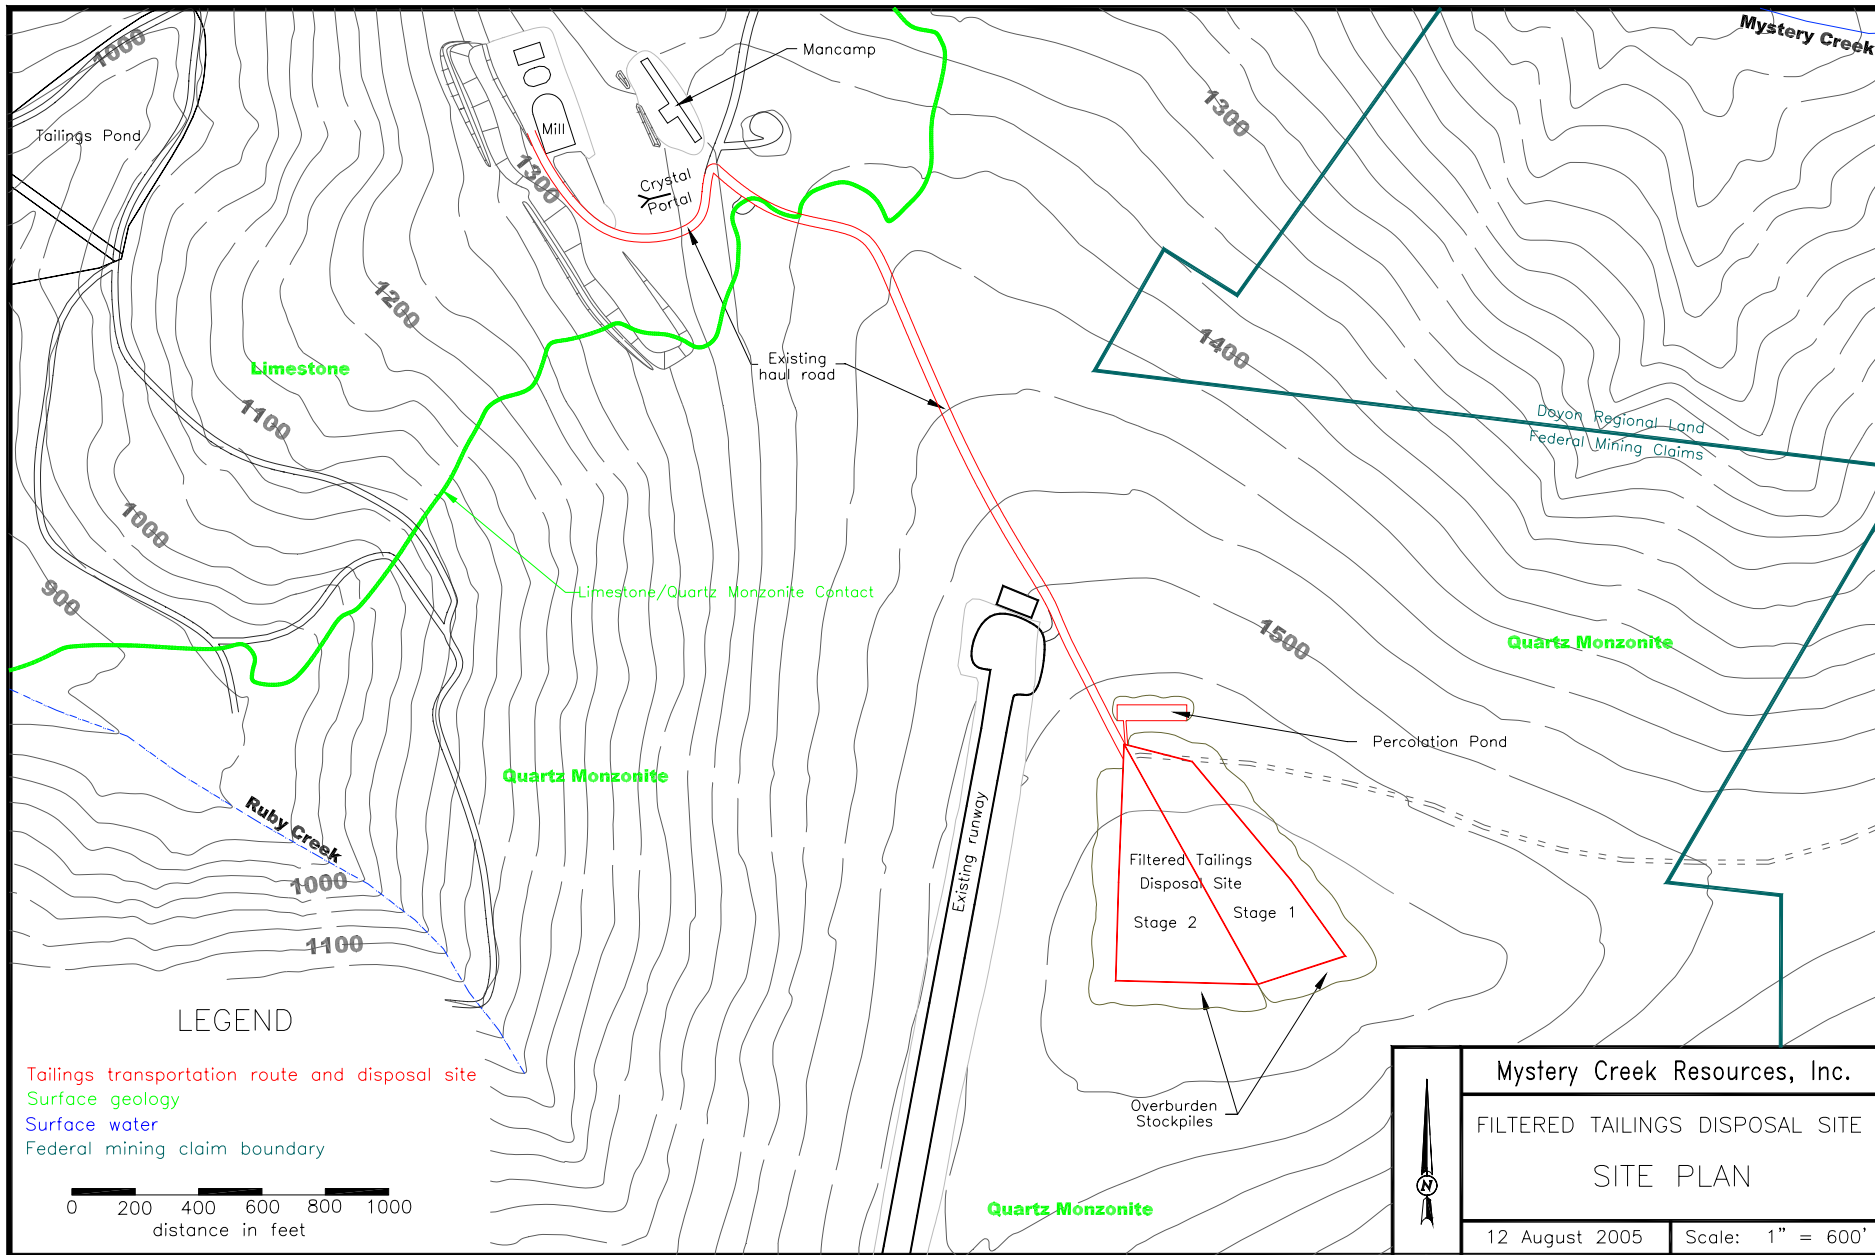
FILTERED TAILINGS DISPOSAL SITE PLAN
